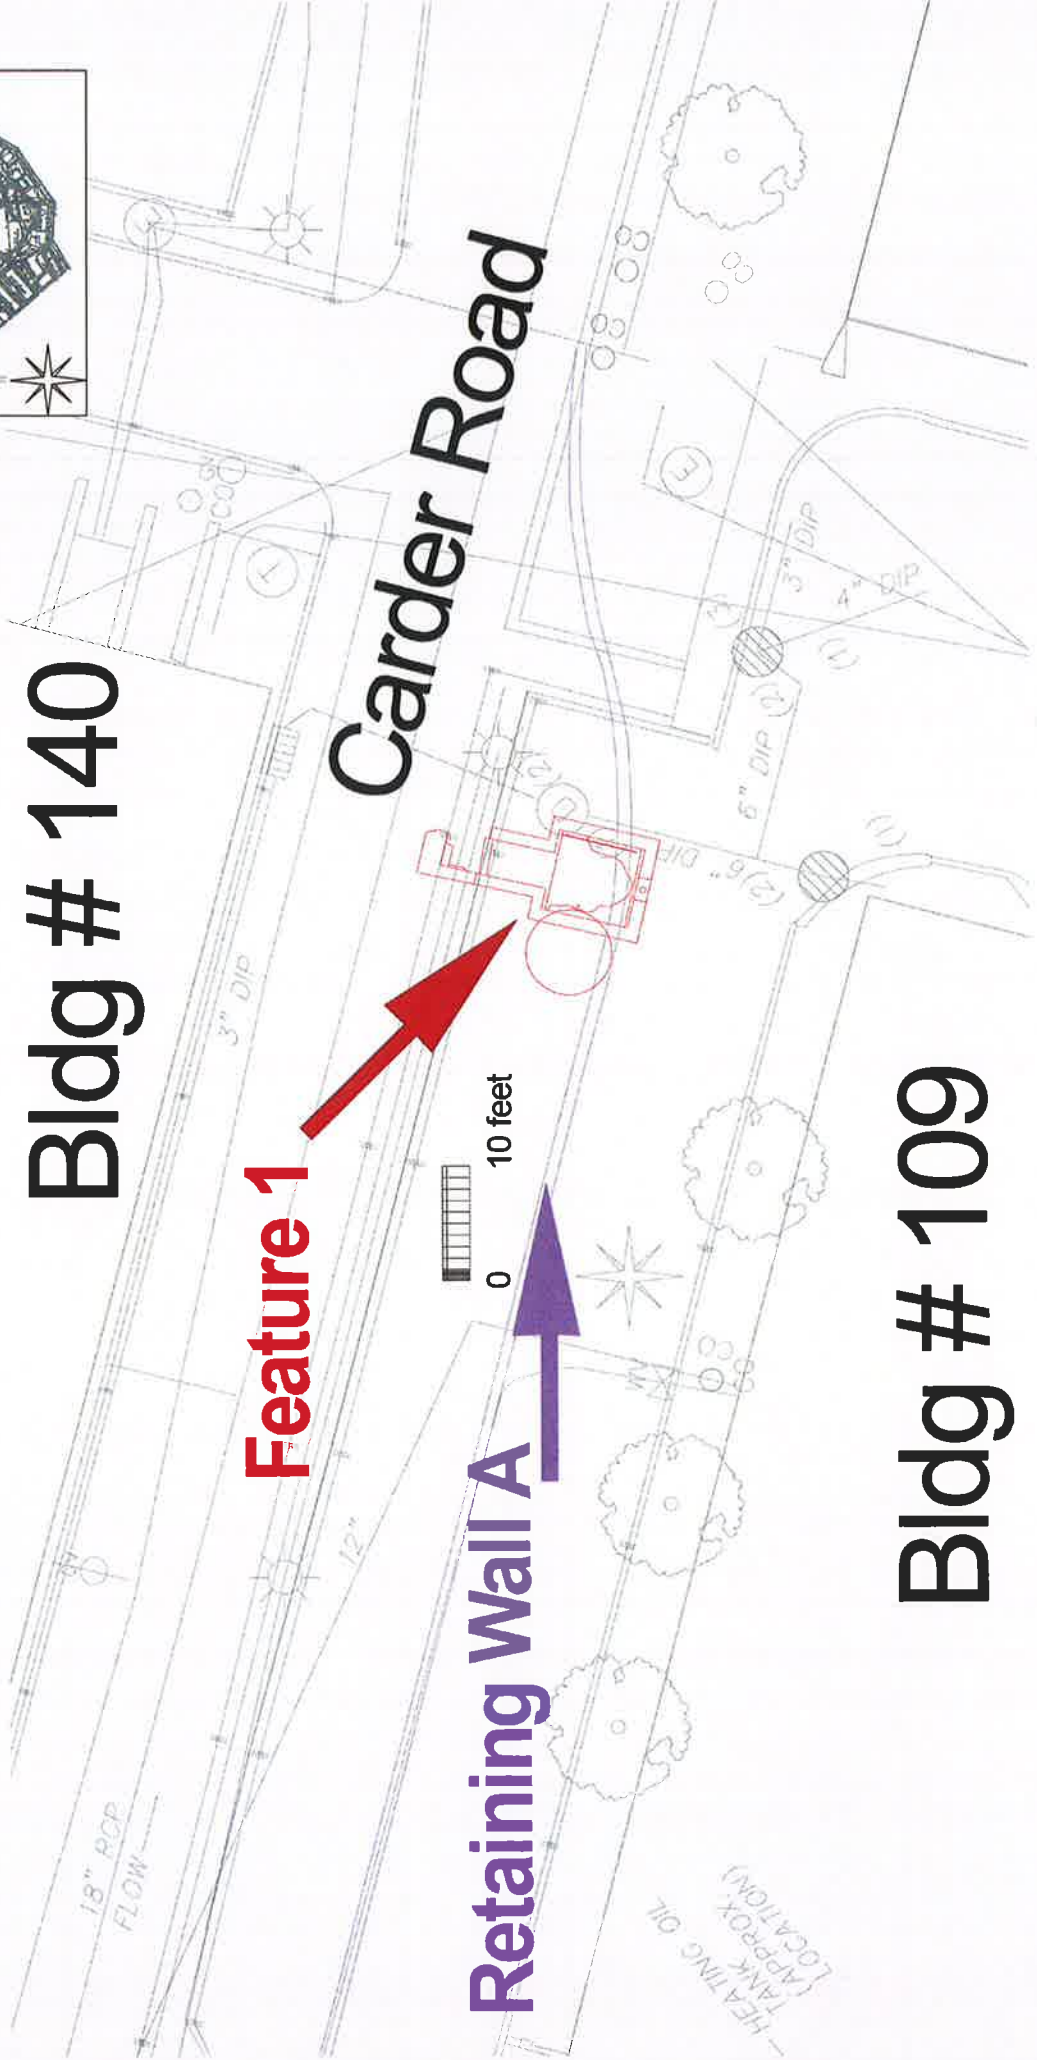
Location of Feature 1 on the existing conditions survey also showing the location of the new retaining wall (Soissons Zone, Tile 1).
